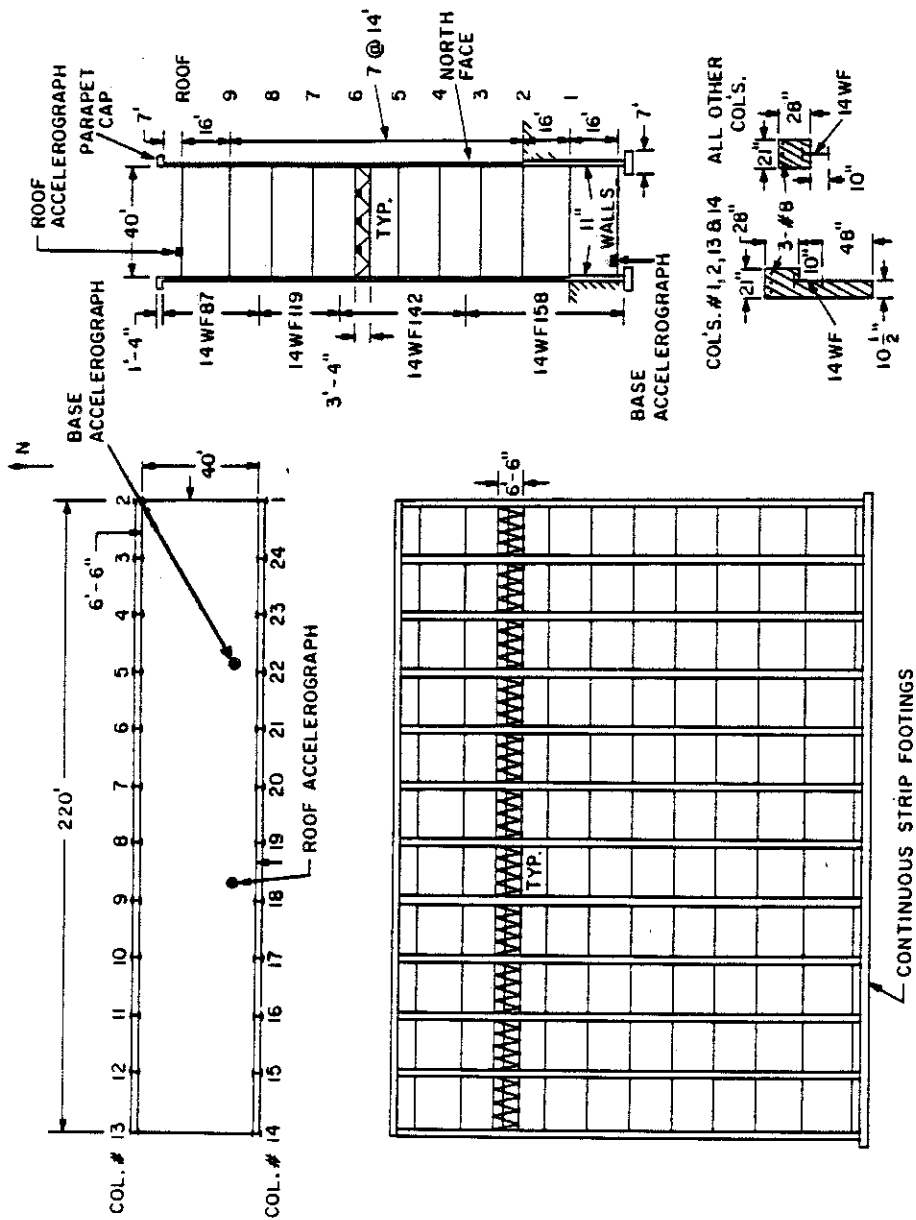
Longitudinal and transverse sections and floor plan of JPL Building 180 [4].
